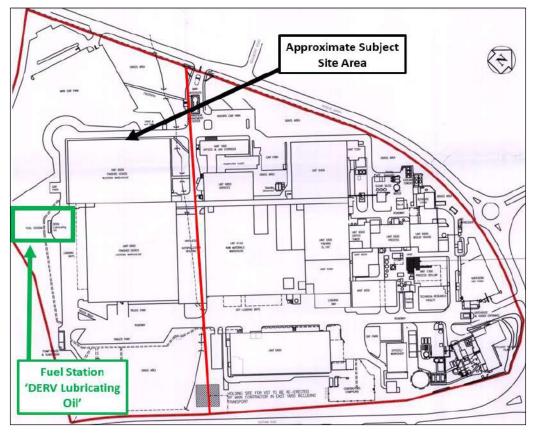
Former Subject (and adjacent larger Kraft) Site Layout
